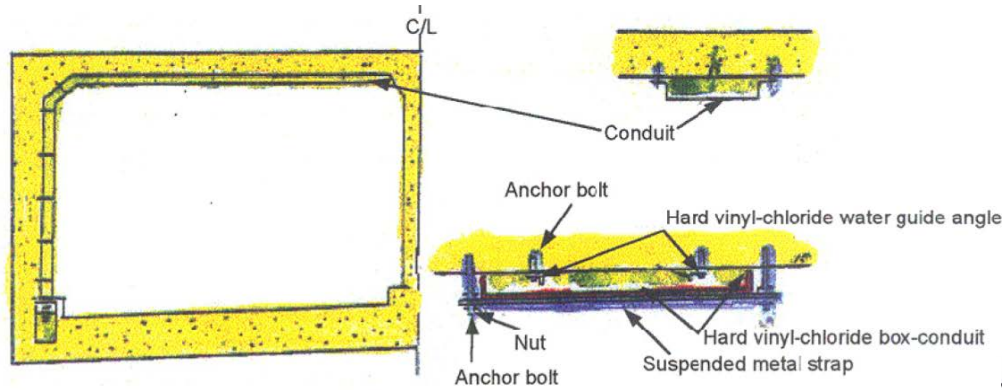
Hard vinyl-chloride box conduit anchored to underside of cast-in-Place concrete roof to convey water leakage (Russell, 2001).
